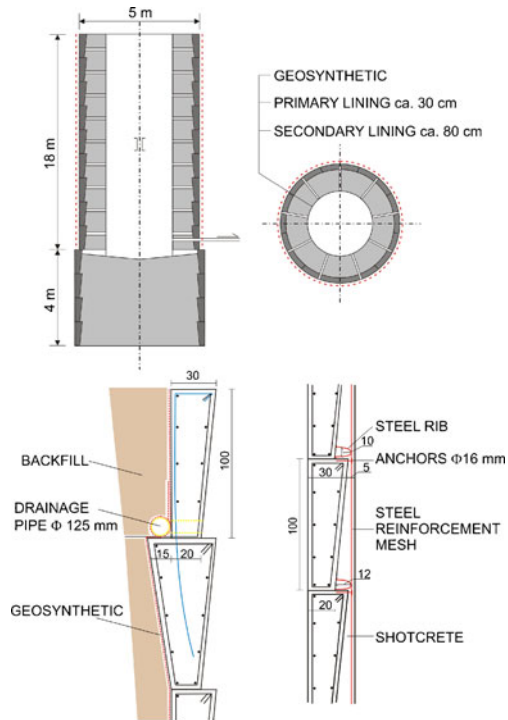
Vertical cross-section of the reinforced concrete shaft
